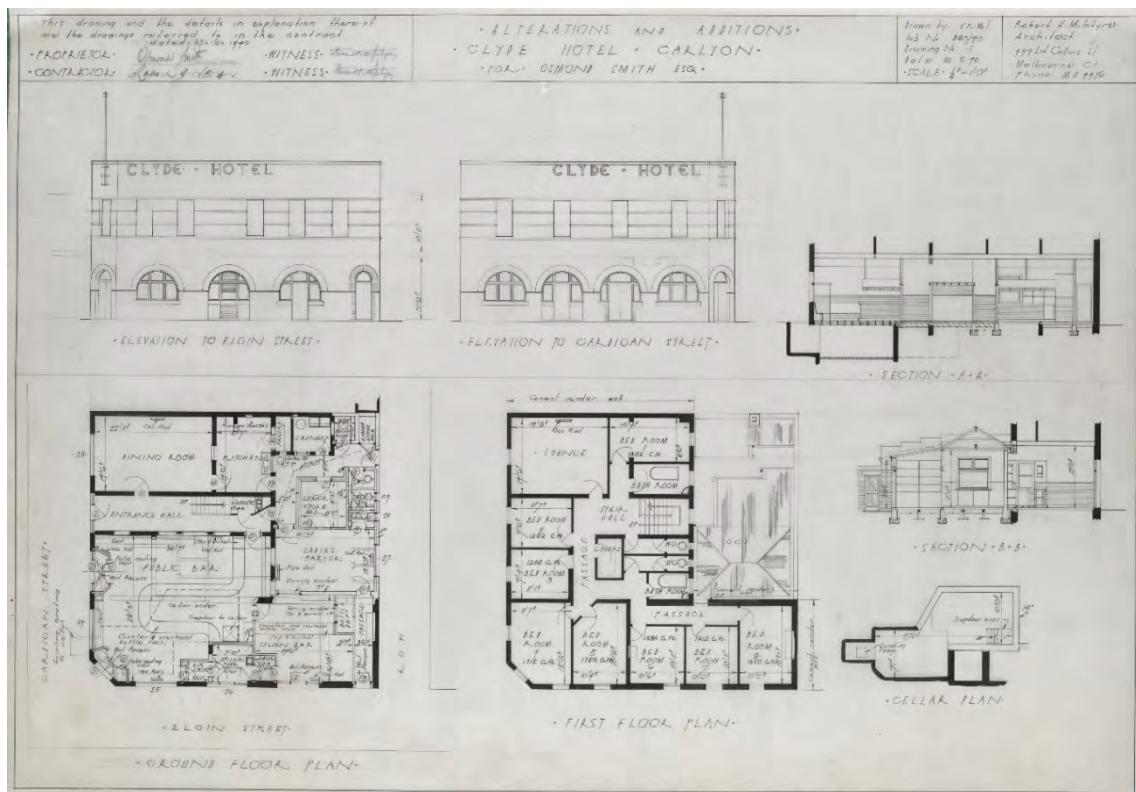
Plan of 1940 renovation works to the Clyde Hotel, designed by Robert H McIntyre
